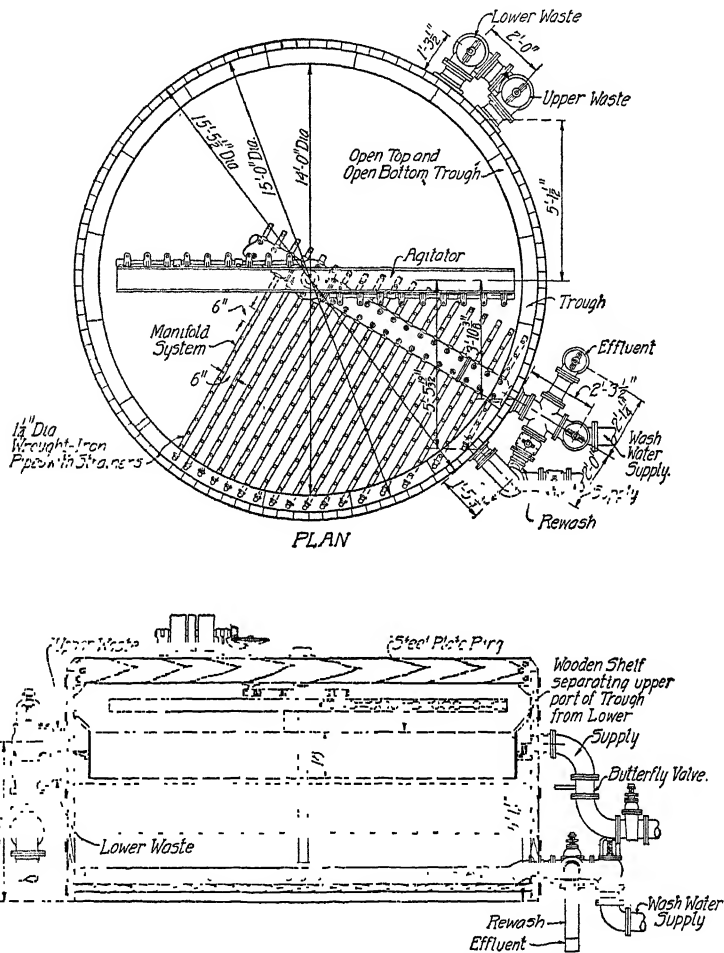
Plan and Sectional Elevation of a Warren Filter at Chester, Pennsylvania
